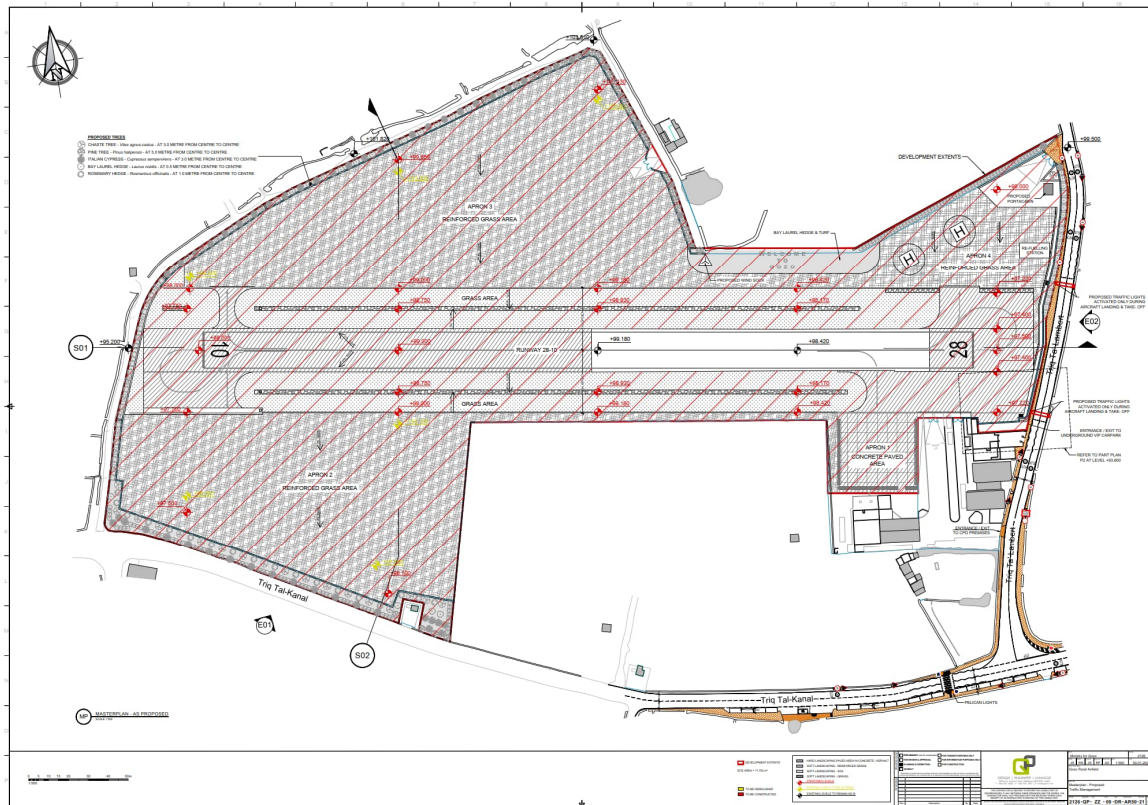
Proposed airfield layout - with runway extension, soft and hard aprons.
